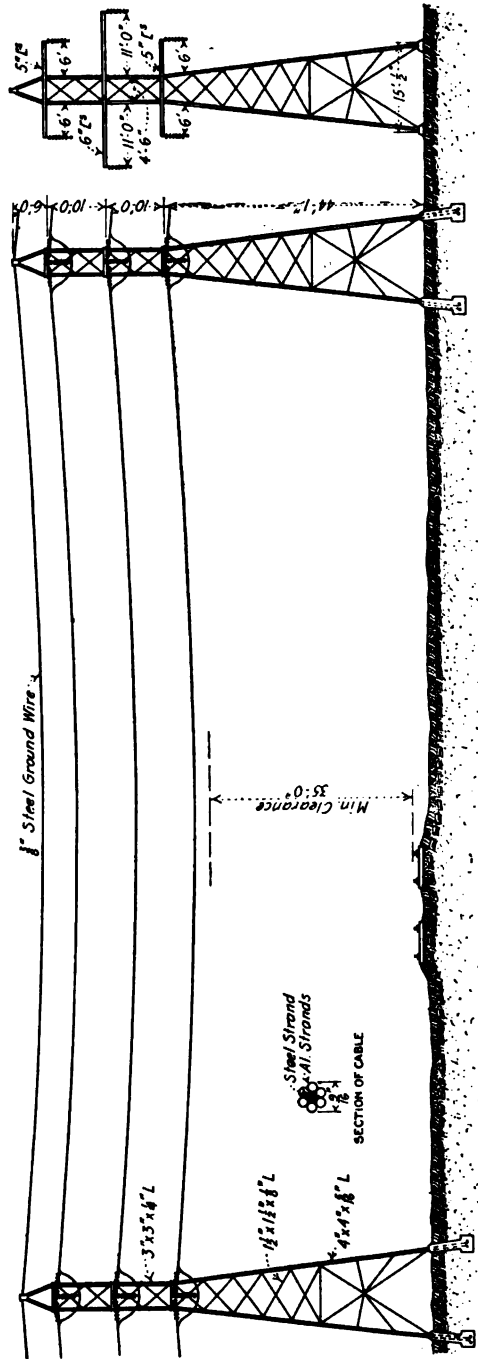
SOUTHERN SIERRAS POWER CO. PROPOSED CONSTRUCTION AT RAILWAY CROSSINGS
